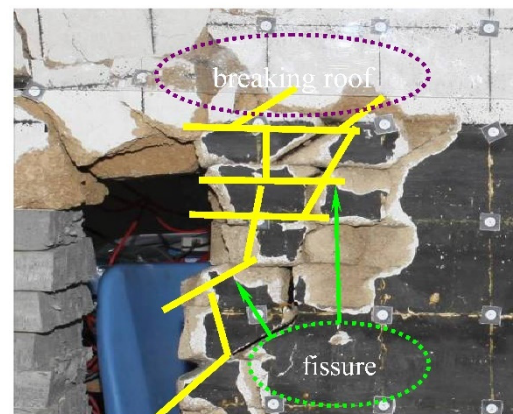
Development of joint and instability form the coal wall rib-spalling ($\alpha = 30^\circ$).
